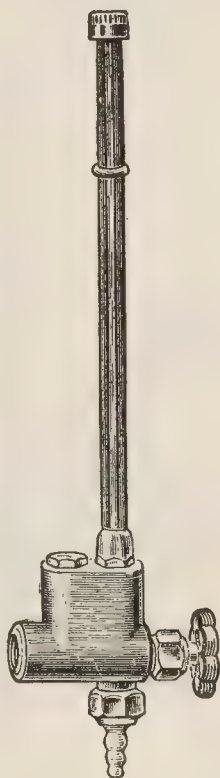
,112.—Fleck mercury gauge for indicating pressure in air pressure test on roughing in work.
